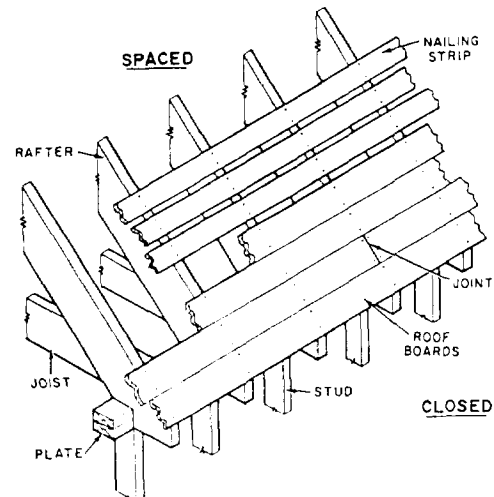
Typical board roof sheathing, showing both closed and spaced types.
